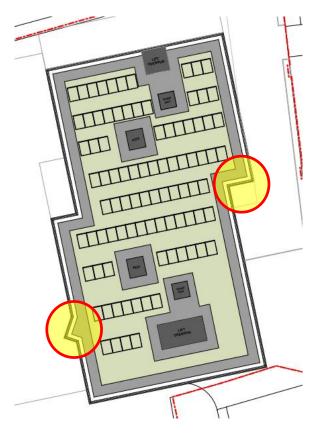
Roof plan for Block B demonstrating the proposed massing change and the bay window in the western facade
